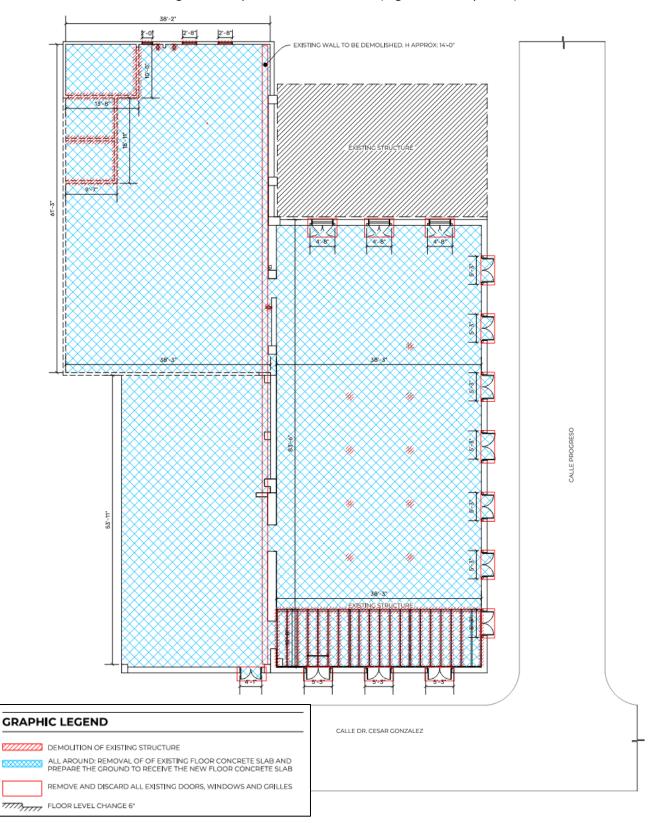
Proposed Demolition Plan (Ingenium Group 2023)
